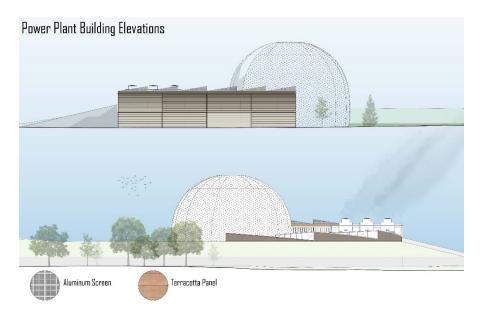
East and West elevations of the power plant. (Source: Author)
